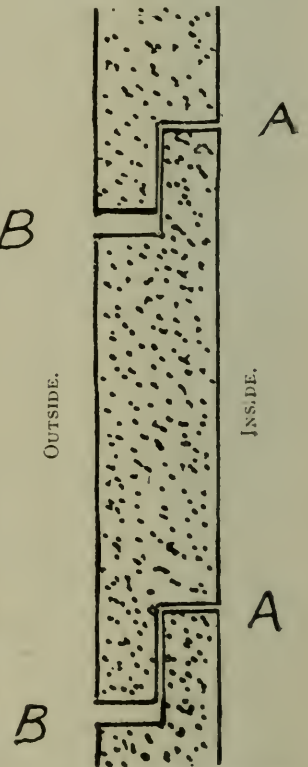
SECTION OF WALLING, SHOWING THE BLOCKS IN CONTACT ON THE INSIDE (A) AND WITH A SPACE ON OUTSIDE (B) WHICH IS AFTERWARDS FILLED WITH MORTAR.
